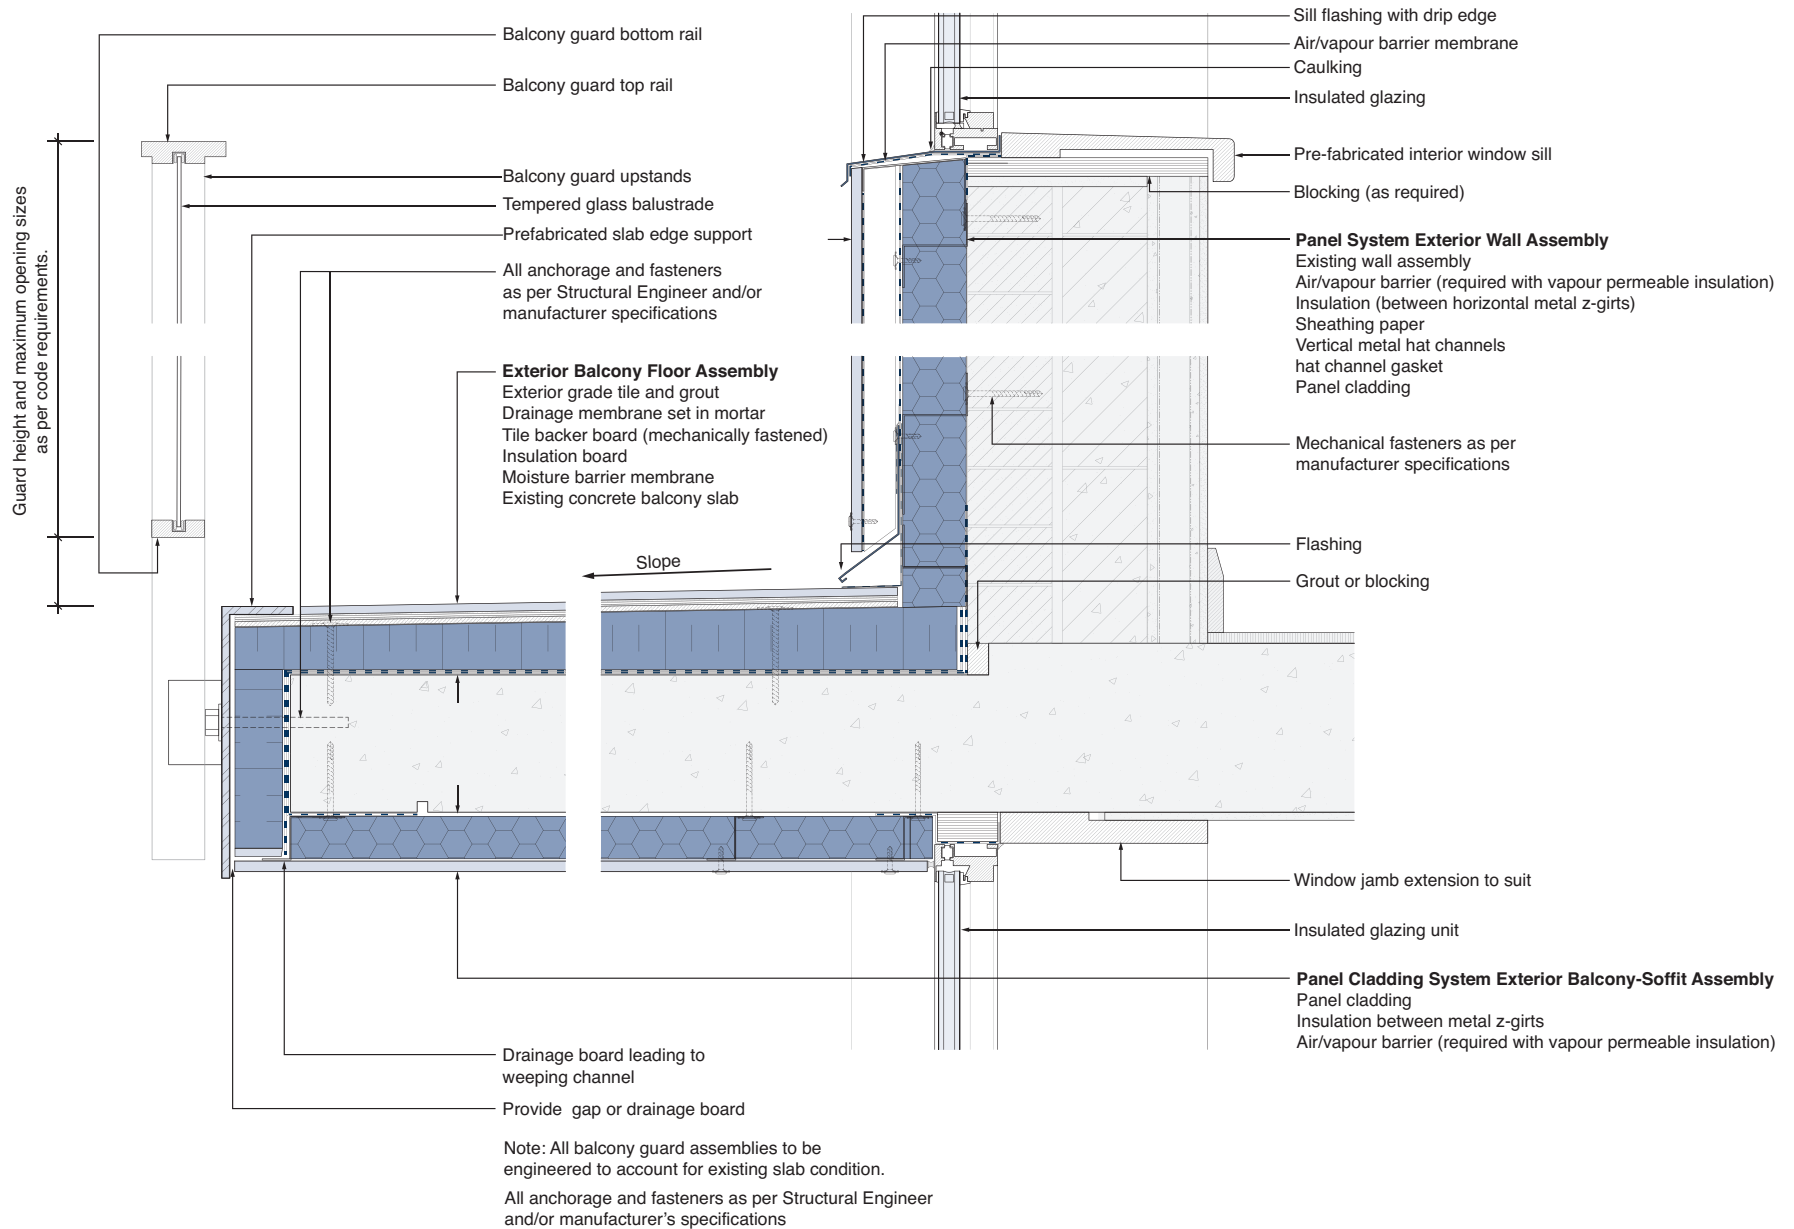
Section through balcony slab overcladding indicates the use of a tile product as an exterior floor finish and traffic surface. Multiple lines of defence against moisture migration are essential for long term durability. The thermal resistance of the insulation material for the slab edge and floor areas should not decrease appreciably under wet conditions. All materials should be corrosion resistant and capable of withstanding freeze-thaw cycles. Alternative products and assemblies providing equivalent wear resistance and durability may be substituted for the floor tile cladding assembly. The wall and balcony soffit have been overclad with a panel system.
